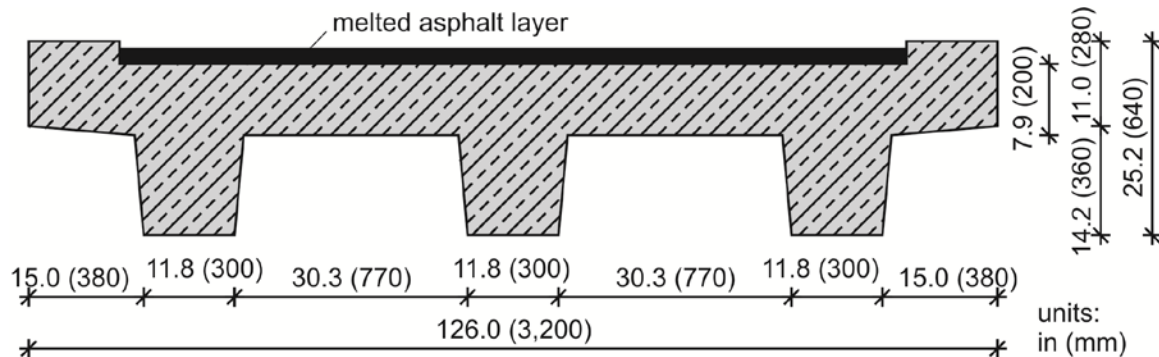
Cross-section of the steel-reinforced concrete bridge
